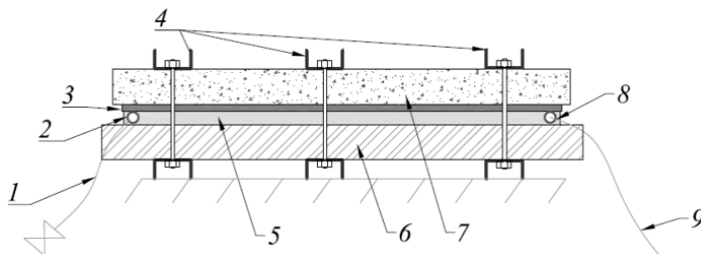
'Tray' device under the working condition: 1 – rubber hose with valve; 2 – outlet valve for air release and liquid drainage; 3 – rubber seal; 4 – ties; 5 – tray; 6 – steel channel; 7 – reinforced concrete lintel; 8 – the inlet valve for feeding the liquid in a tray; 9 – hose for feeding the liquid in a tray
